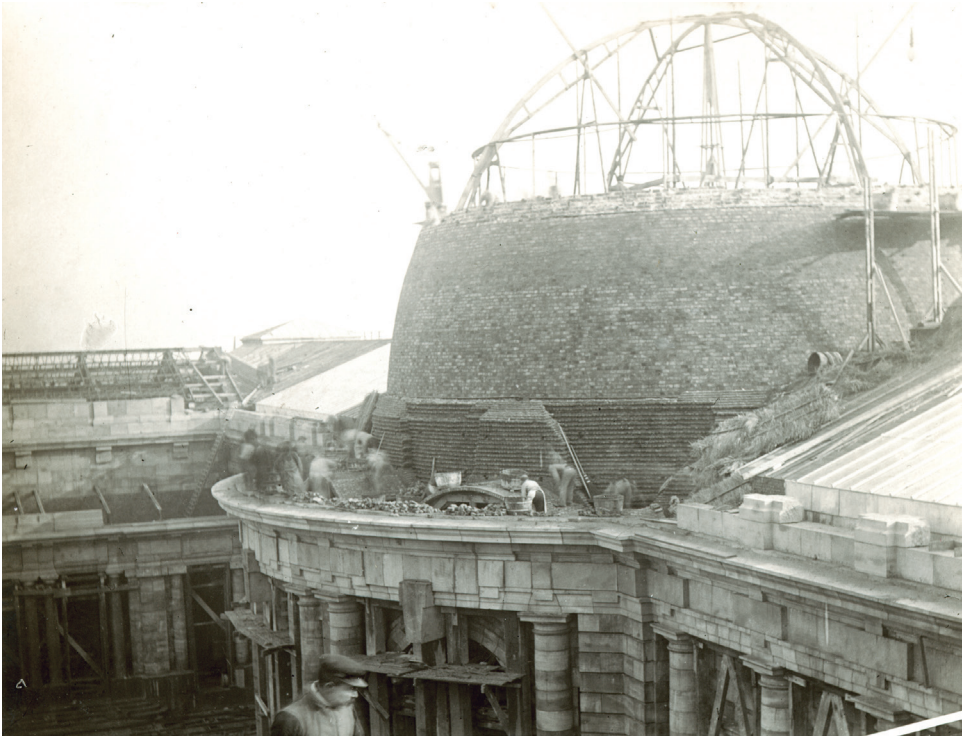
Central dome of the Congo Museum under construction (HP.1968.10.6–52, RMCA Tervuren collection; Charles Girault archives).
